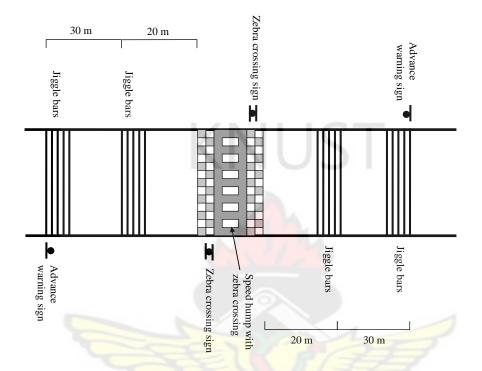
Plan of trapezoidal hump-pedestrian crossing
